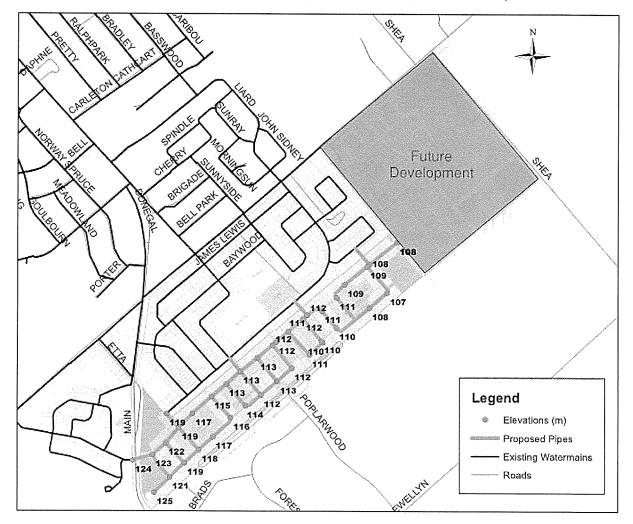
Ground Elevations (m) in Area of Proposed Development
